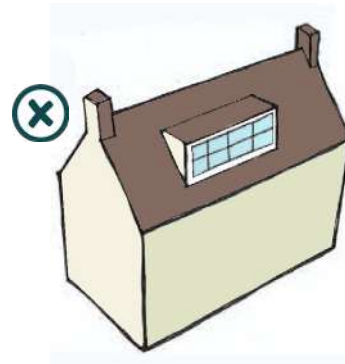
Loft conversion incorporating long shed dormer which is out of scale with the original building.
